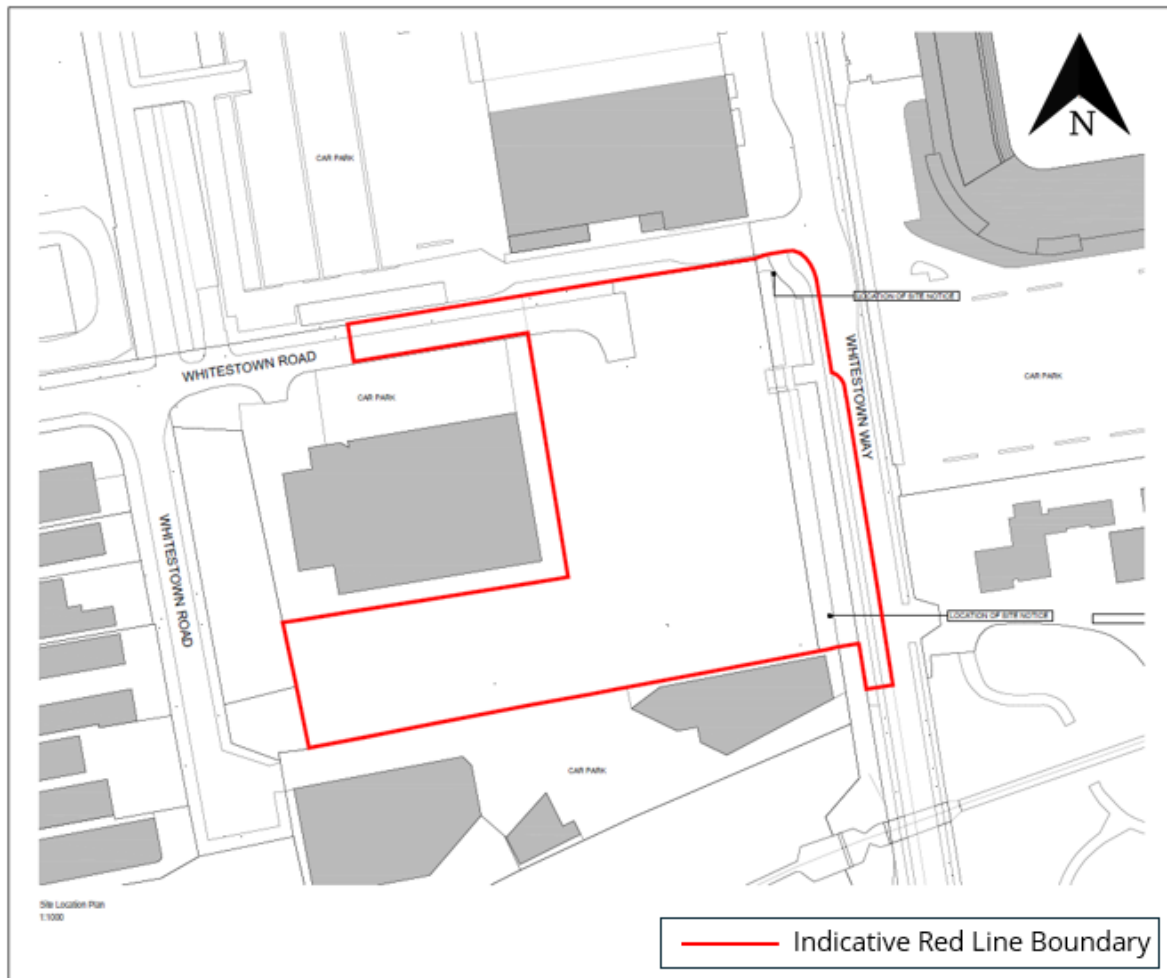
Subject site indicative Redline Boundary (Source: Google Earth Pro)
